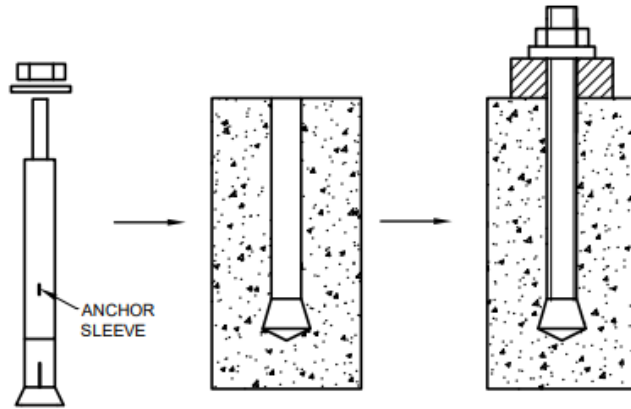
TYPICAL UNDERCUT ADHESIVE ANCHOR
